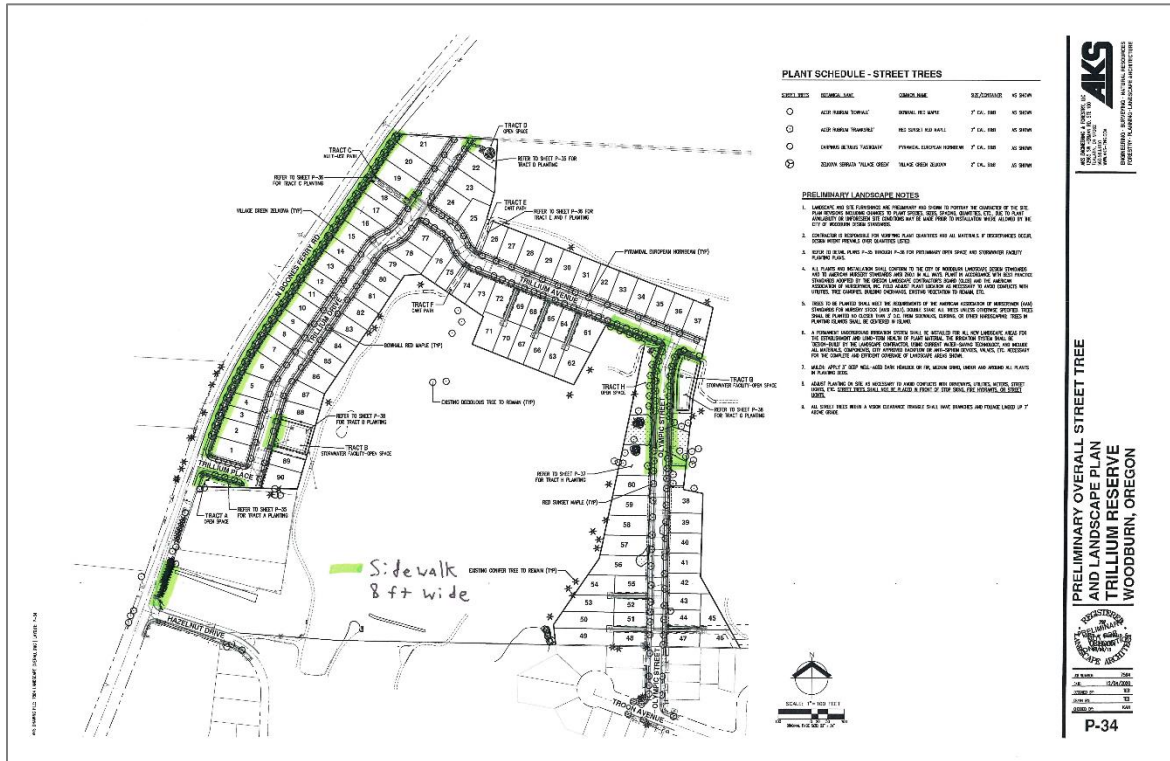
Sidewalks (green: min 8 ft wide)
